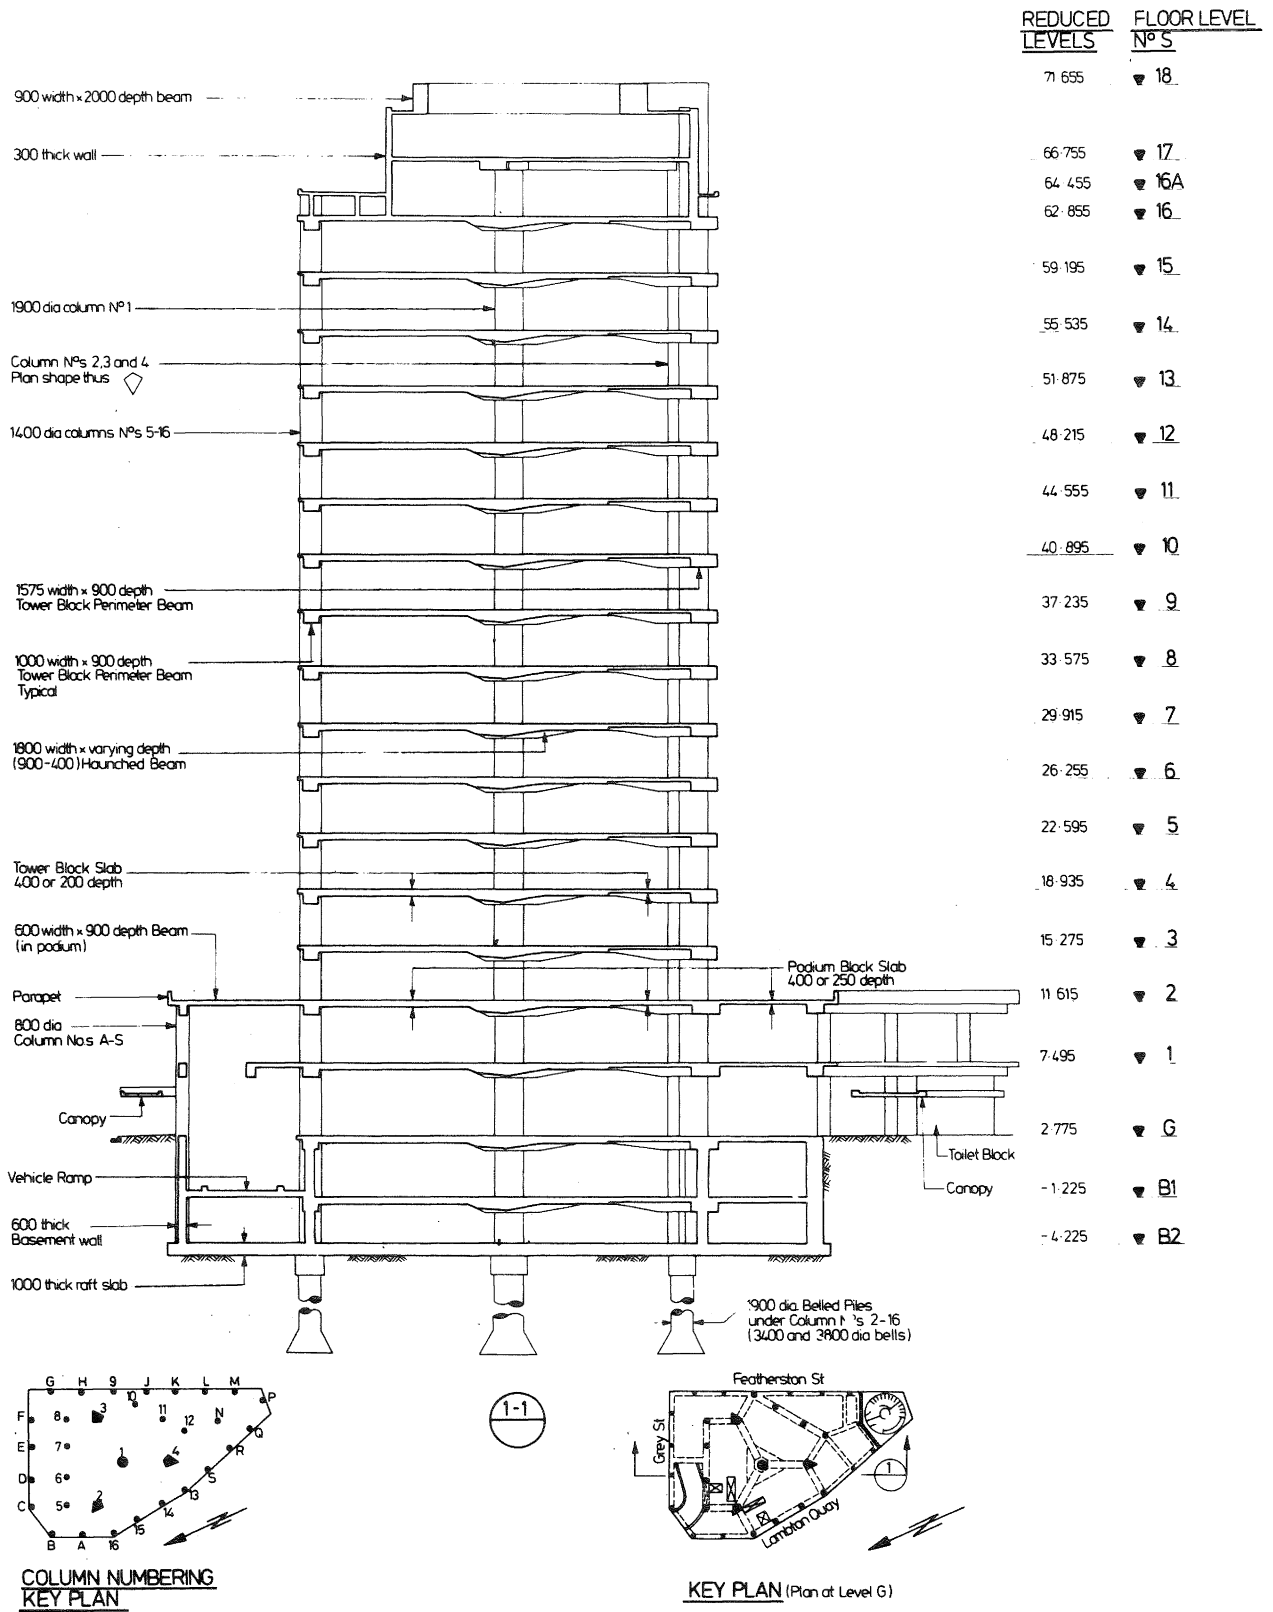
SECTIONAL ELEVATION NORTH-SOUTH
